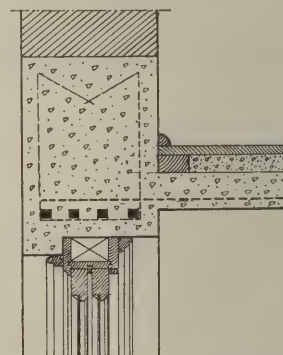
Showing How the Lintels Over Window Heads Are Designed.
